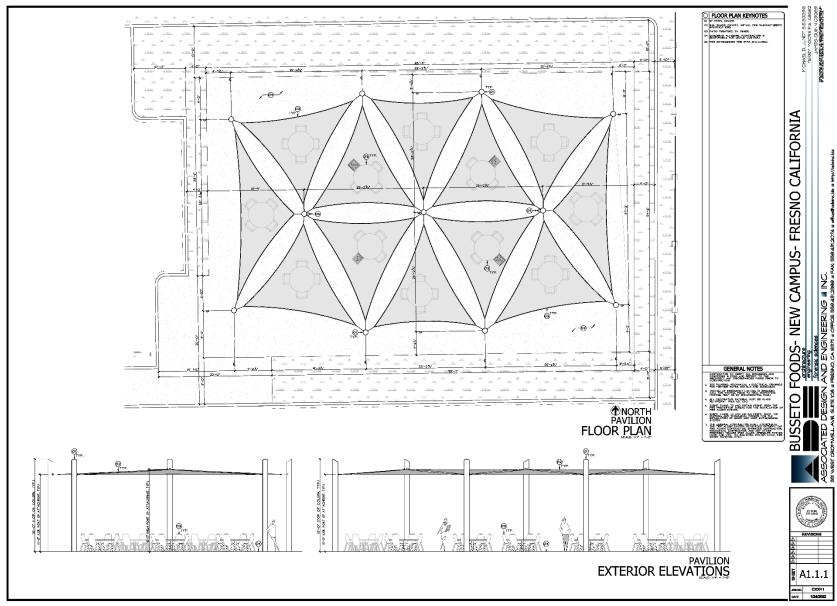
Conceptual Floor Plan and Elevation of the proposed Pavilion
